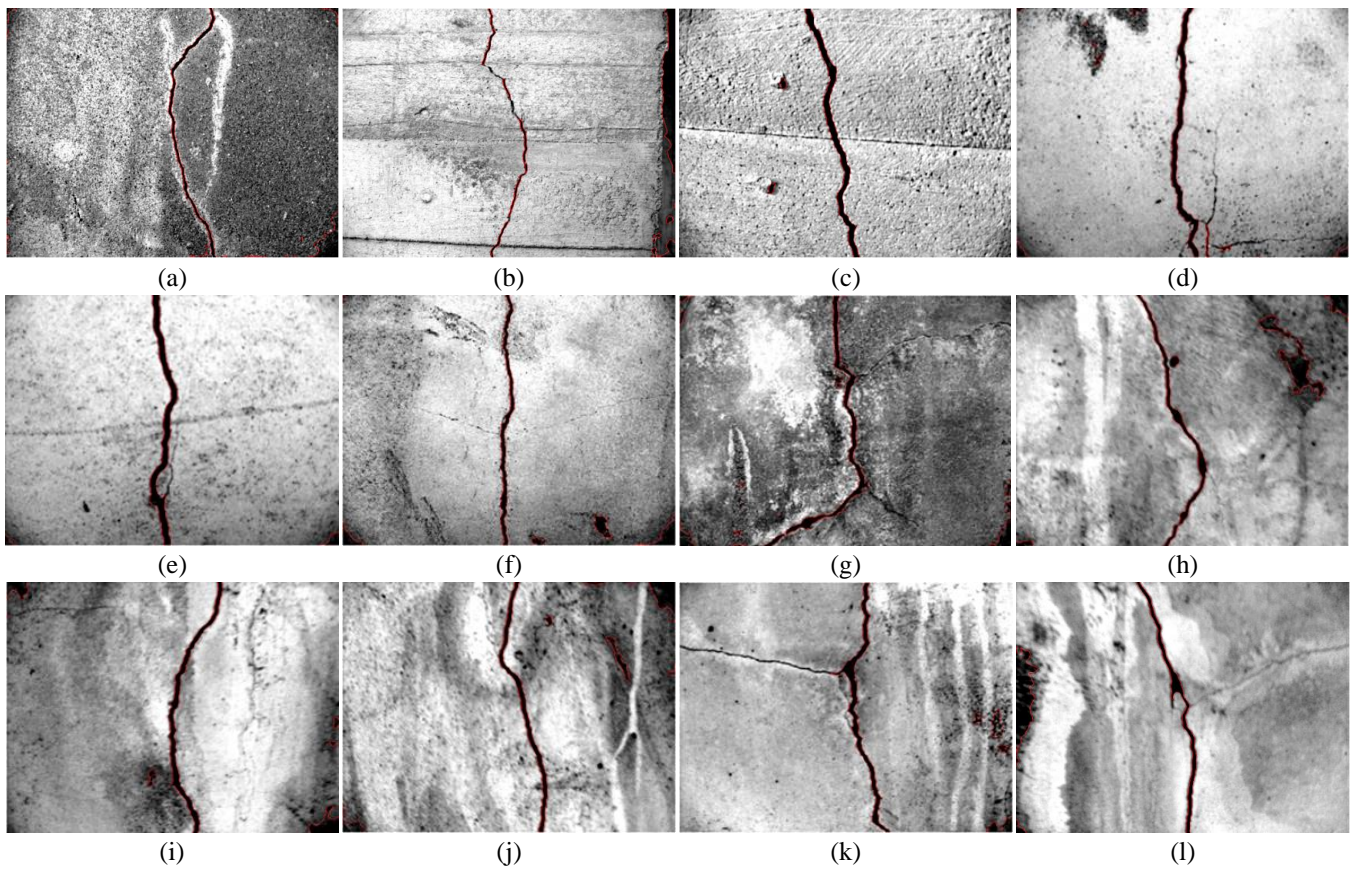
Segmentation result of concrete building cracks using MSED-II
